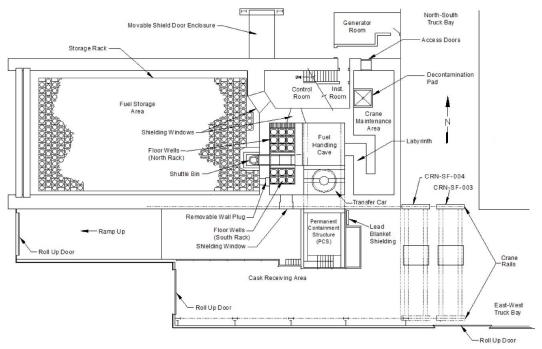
Plan view of the Irradiated Fuel Storage Facility.
